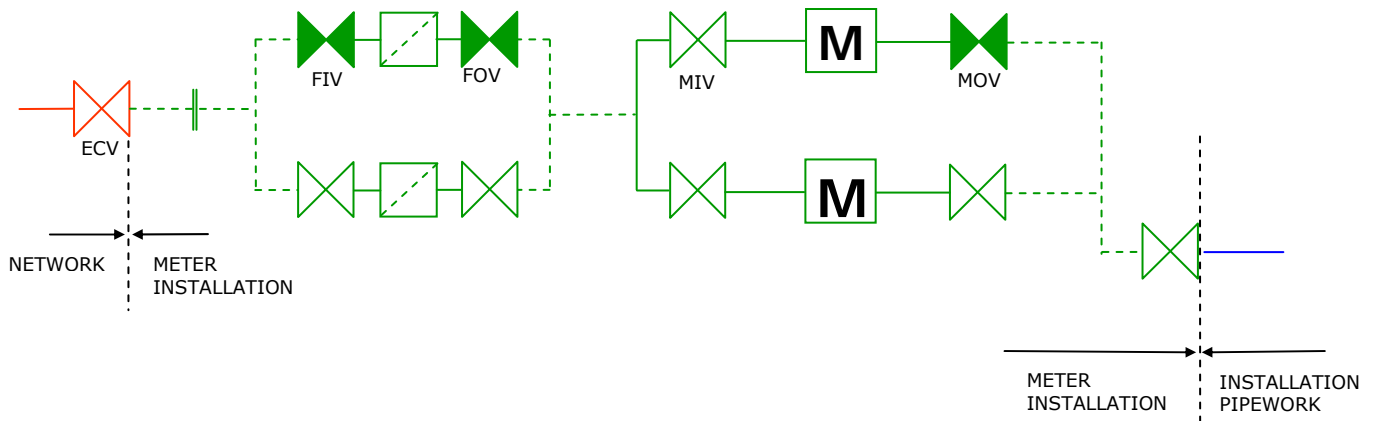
RECOMMENDED ARRANGEMENT.
